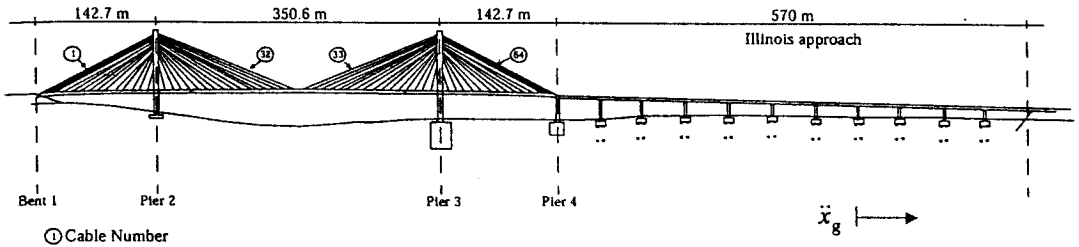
Schematic of the Cape Girardeau bridge (Dyke et al. 2000)
